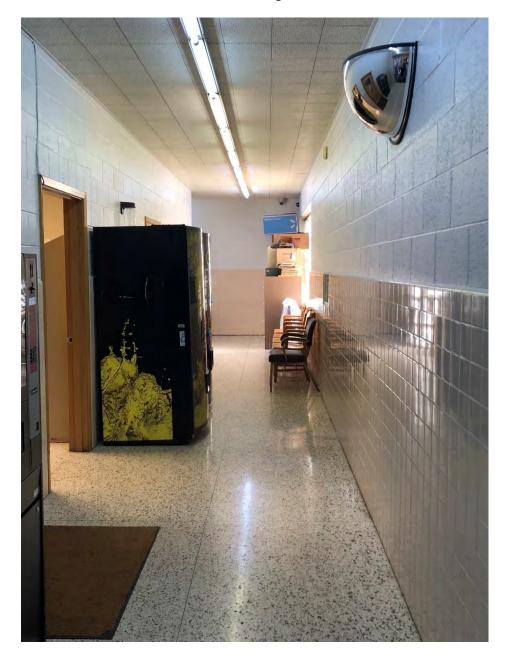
First floor corridor in addition showing entrance to jail. Camera facing northeast.
